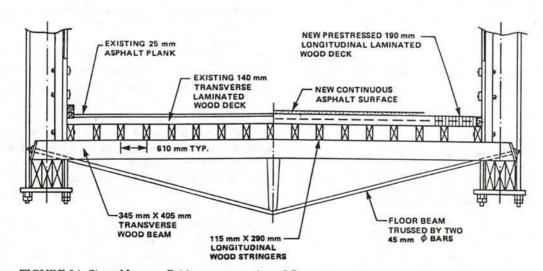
Sioux Narrows Bridge, cross-section of floor system.
